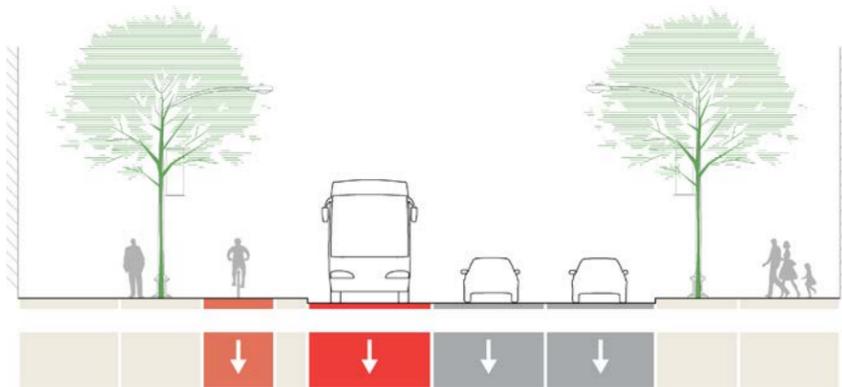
Eighth Street typical section Guadalupe Street to Trinity Street
